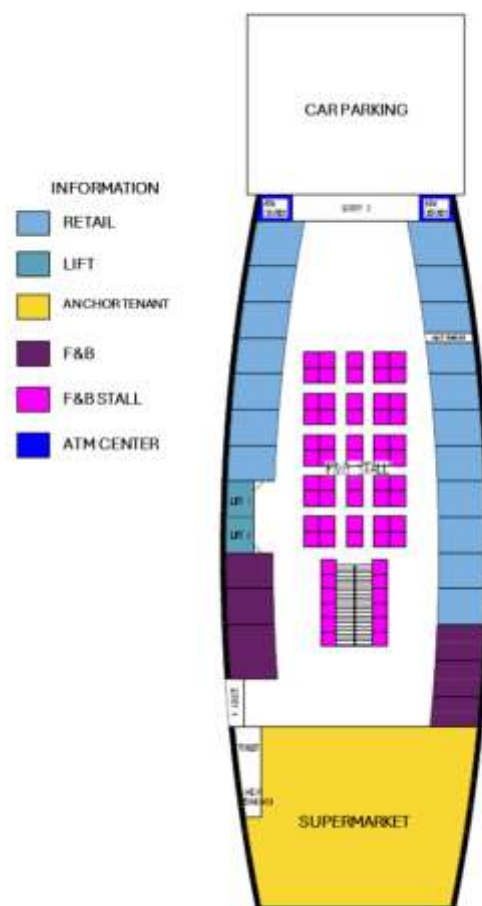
Royal Batam Mall Lower Ground (LG) Schematic Plan
